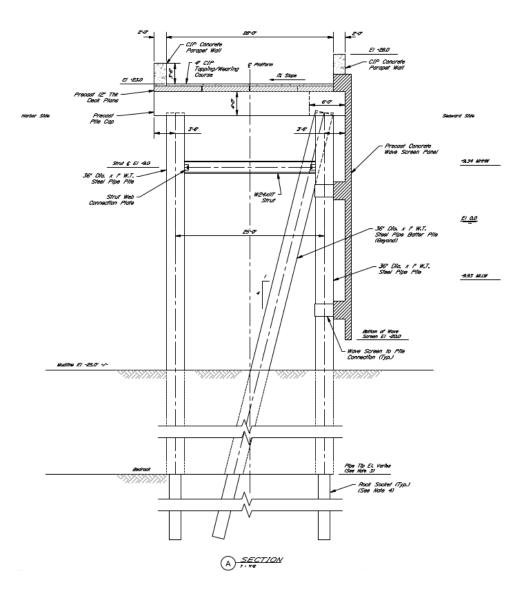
Typical Section of Pile-Supported Platform Breakwater
